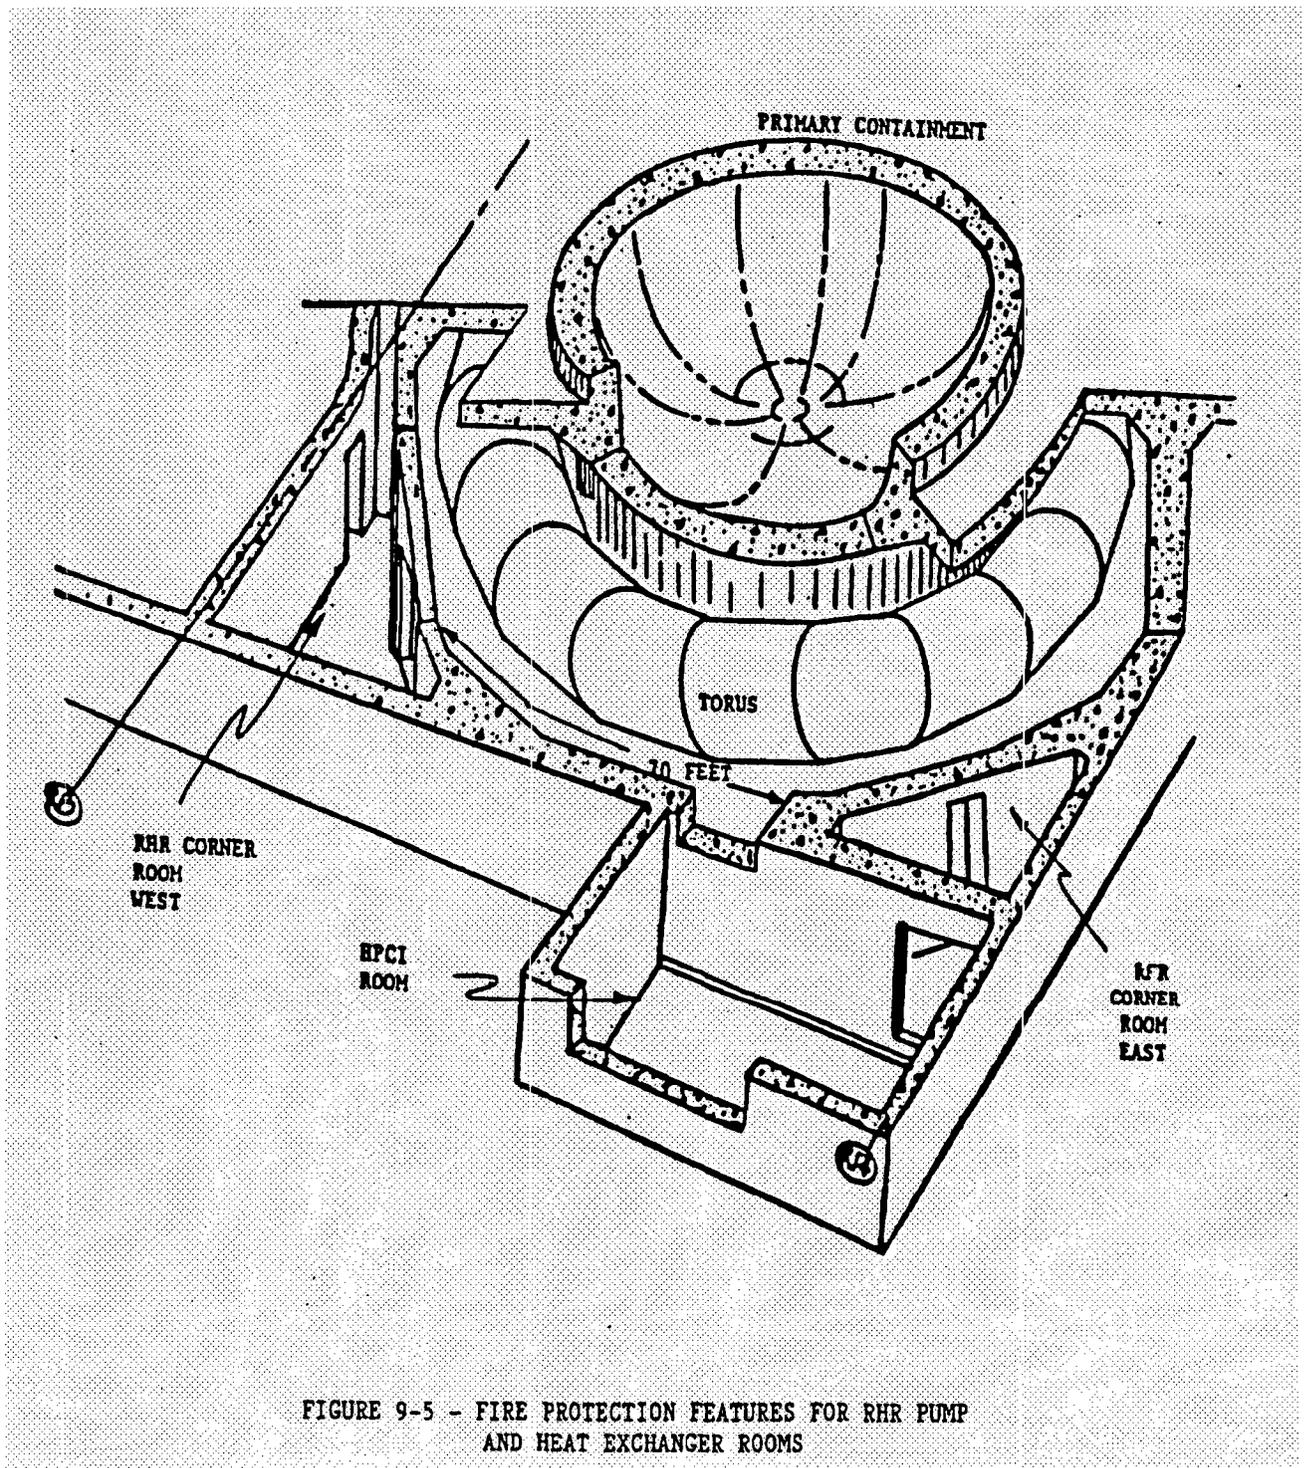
FIRE PROTECTION FEATURES FOR RHR PUMP AND HEAT EXCHANGER ROOMS
